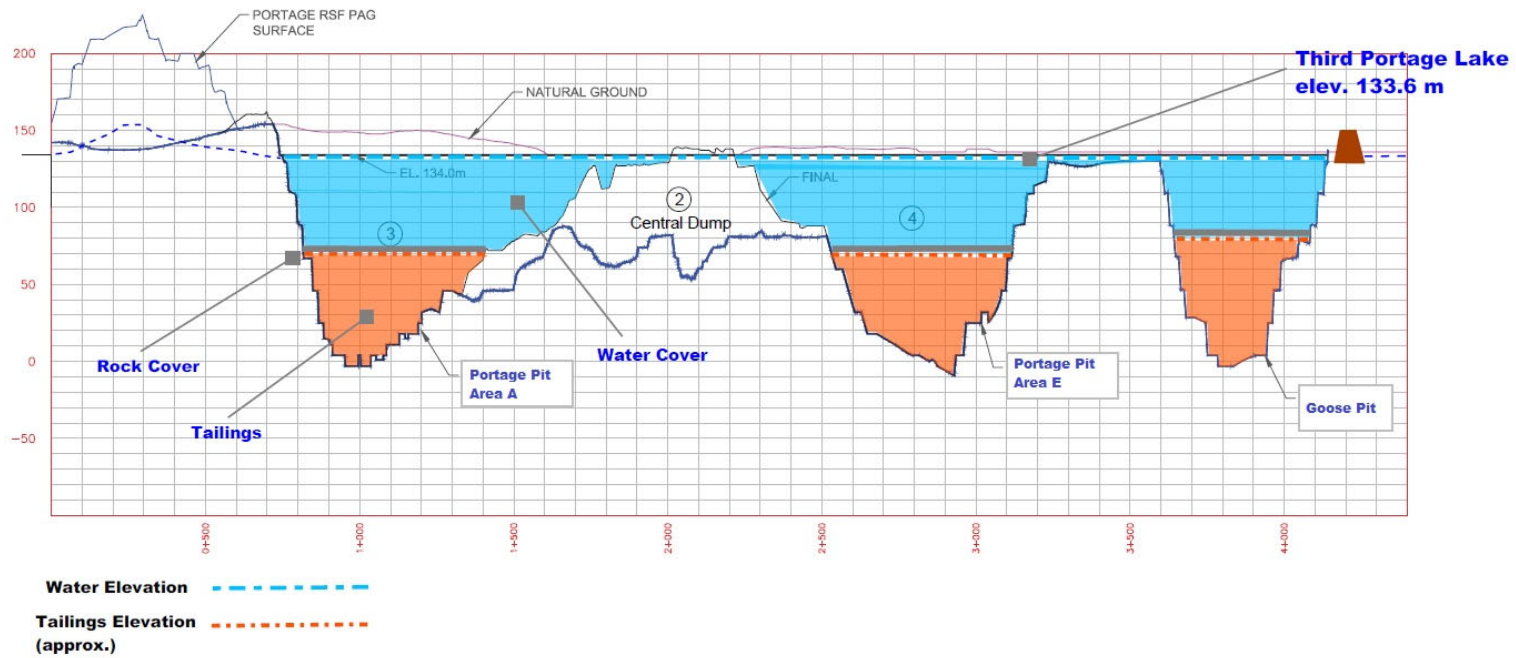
Schematic Cross Section of Portage Pit and Goose Pit
